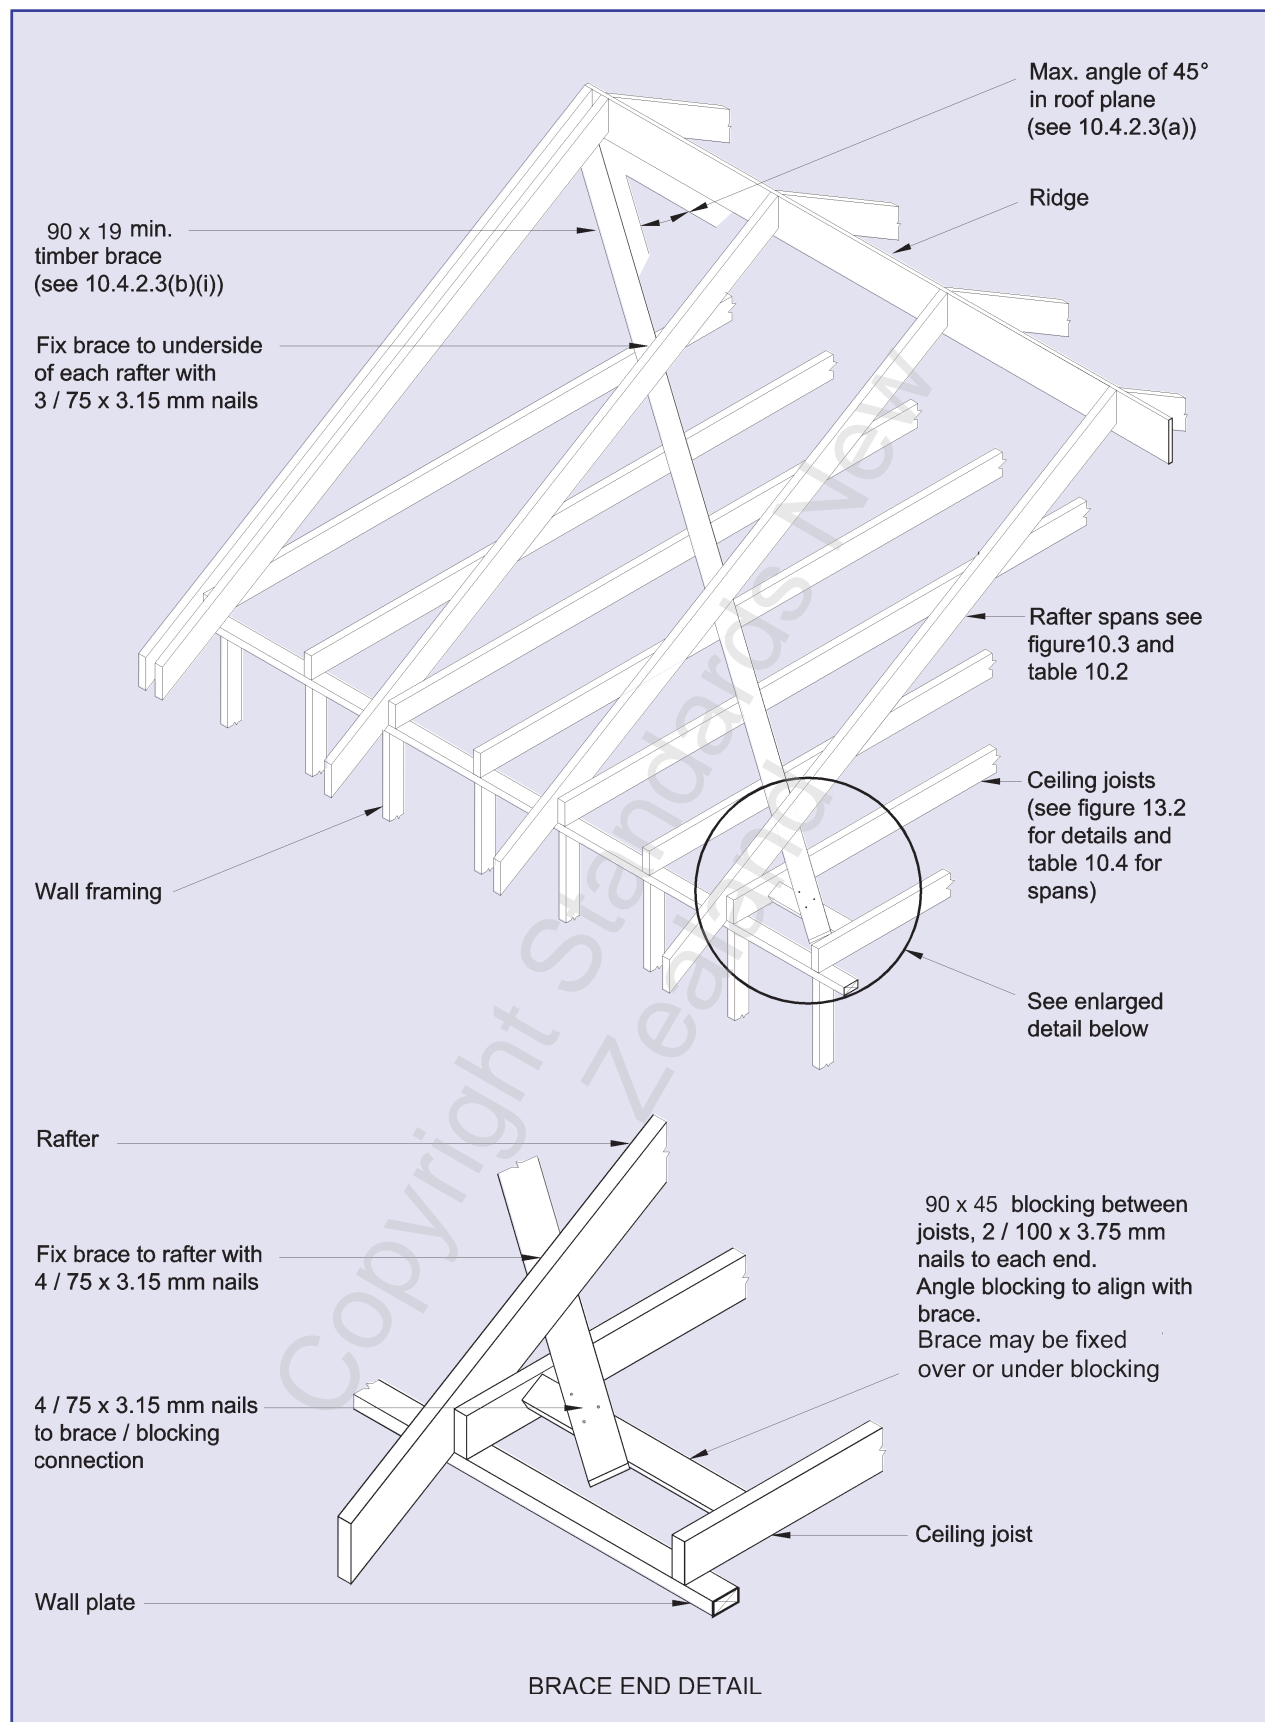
Roof plane diagonal brace – Timber (see 10.4.2.3)
